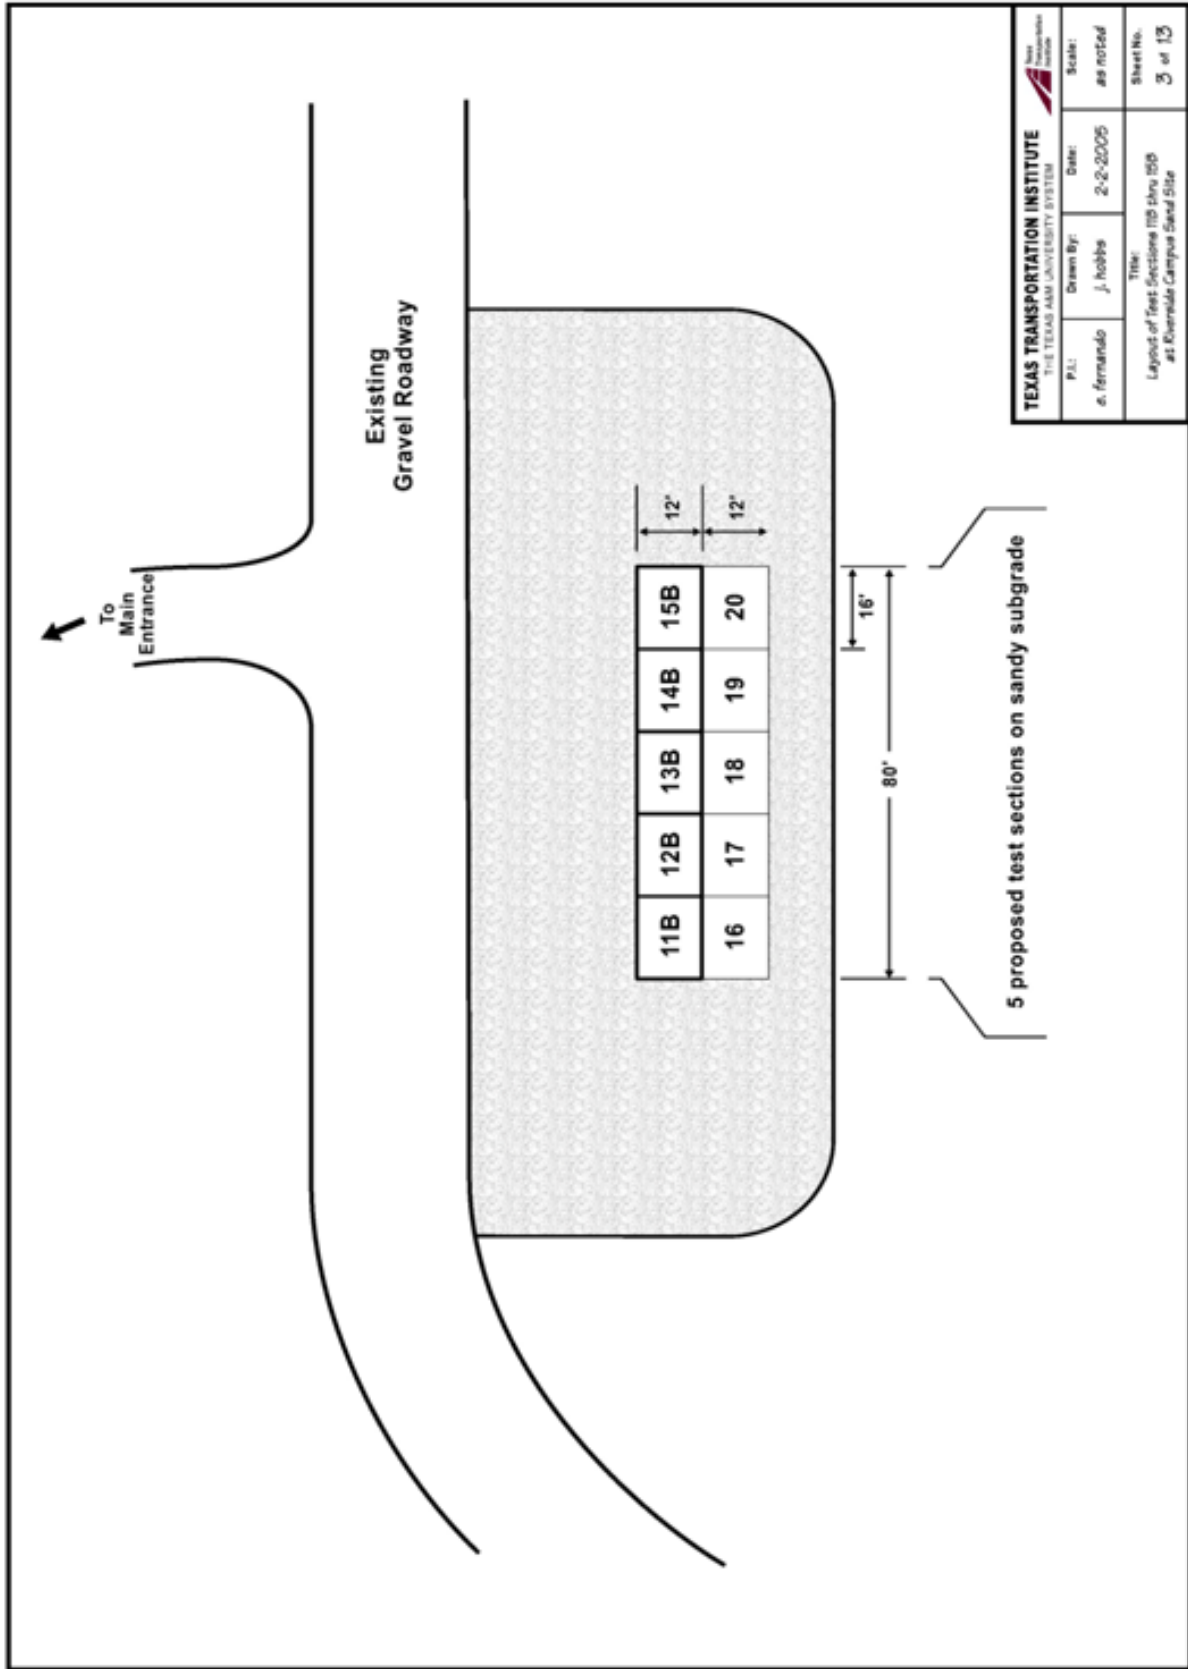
Layout of Stabilized Sections on Sandy Subgrade.
